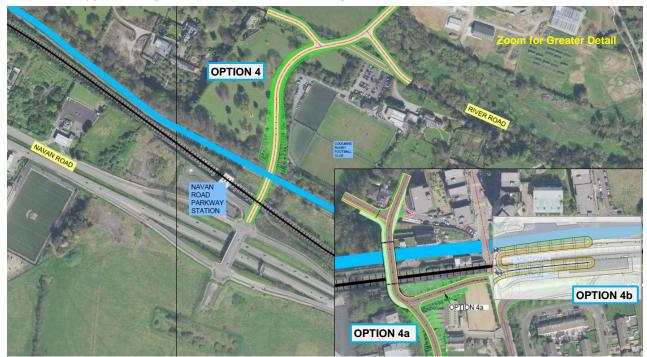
Ashtown Option 4 over Rail and Canal at Navan Parkway Station
